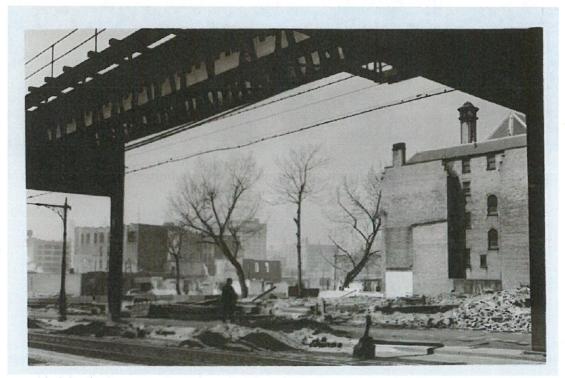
Myrtle Avenue - St. Edward's Place (NW Corner, South Face of church after corner buildings demolished) (NYPL 1941).
